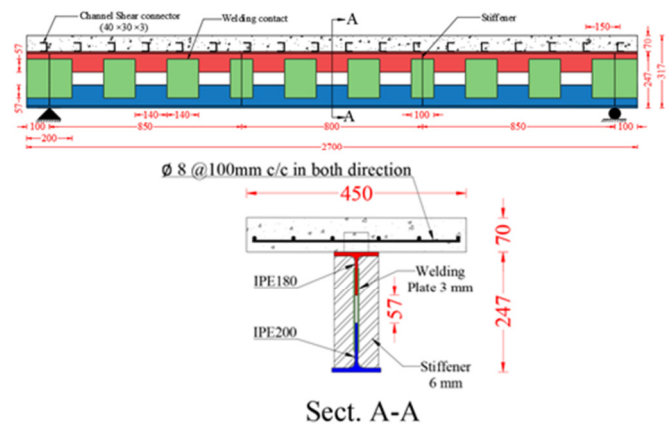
Details of the BS-E30-T3-L140 specimen.
